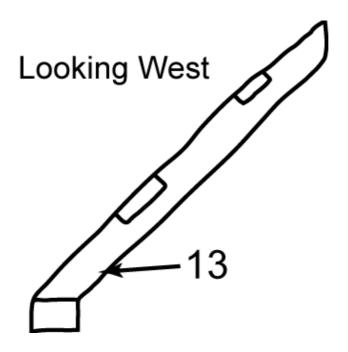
Sketch of truss 8, viewed looking west, showing sample location
